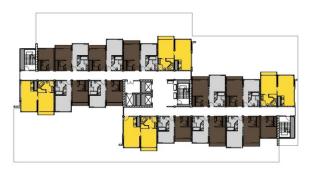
Diagram of a Typical Guestroom Floor showing the Guestroom Mix
